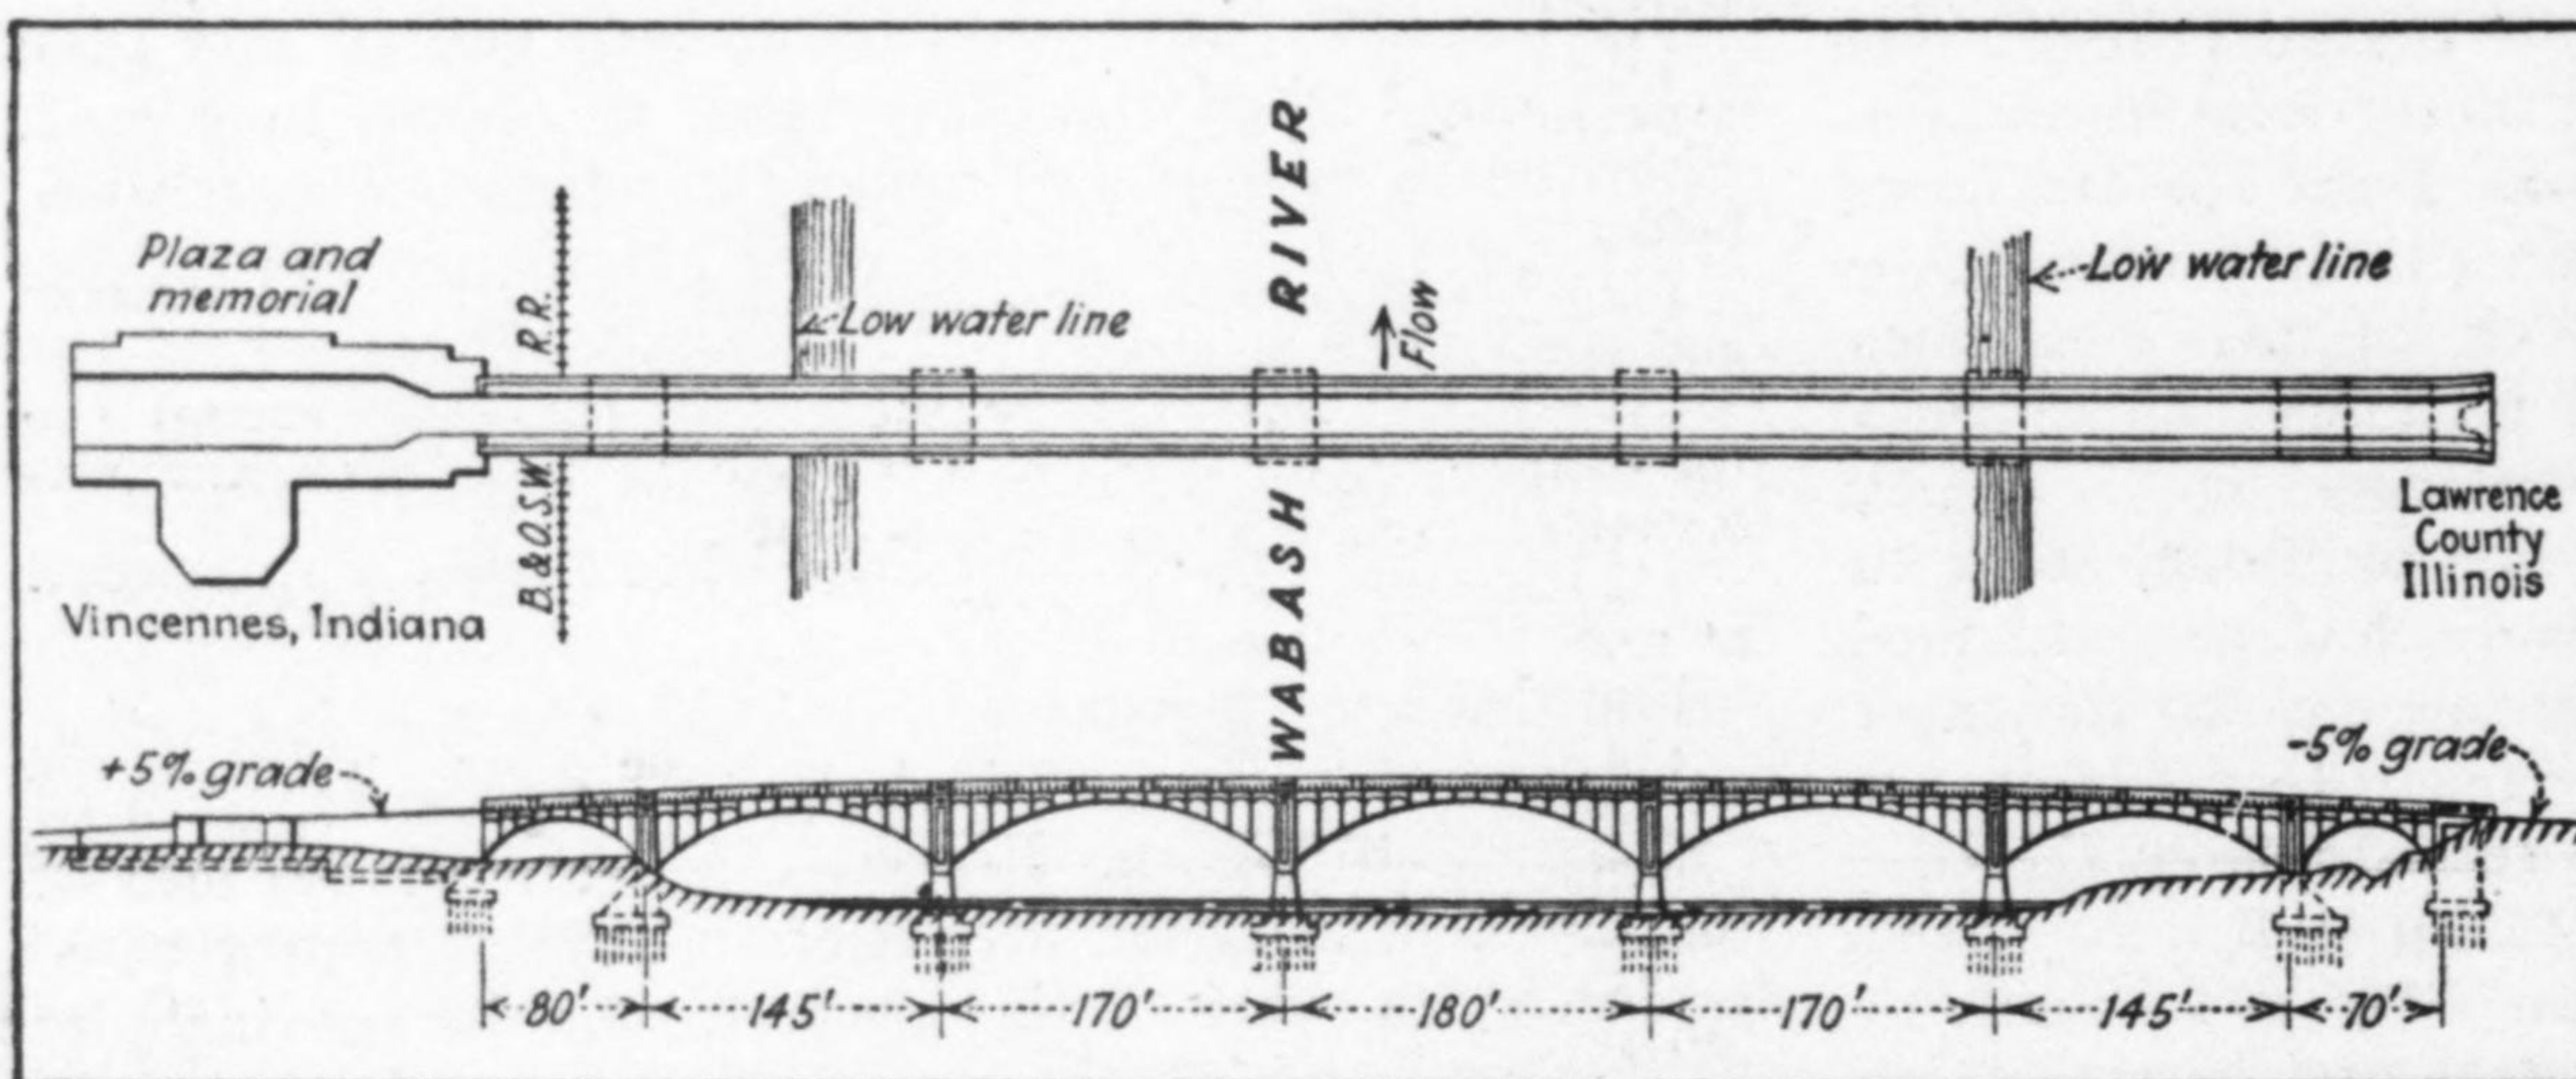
PROPOSED CONCRETE ARCH BRIDGE
